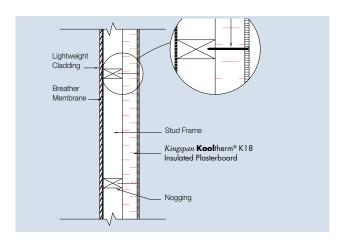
Side elevation - Lightweight cladded stud wall with Kingspan Kooltherm® K18 Insulated Plasterboard
